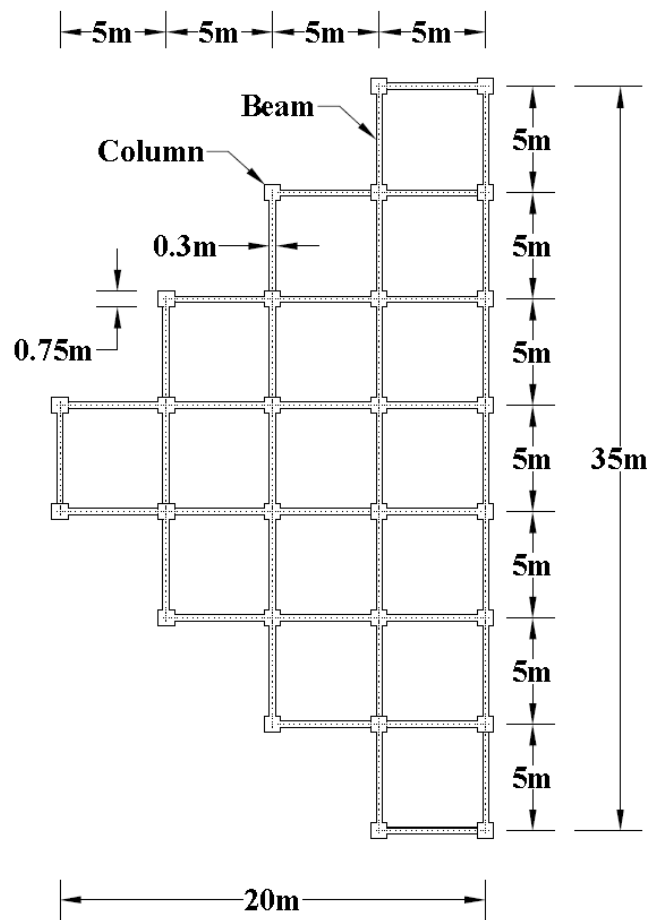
Ground floor plan of Plus Shape-2 building
